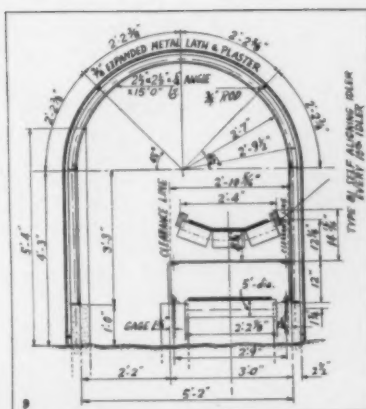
Construction details of tunnel made with expanded metal lath and plaster which houses long conveyor
